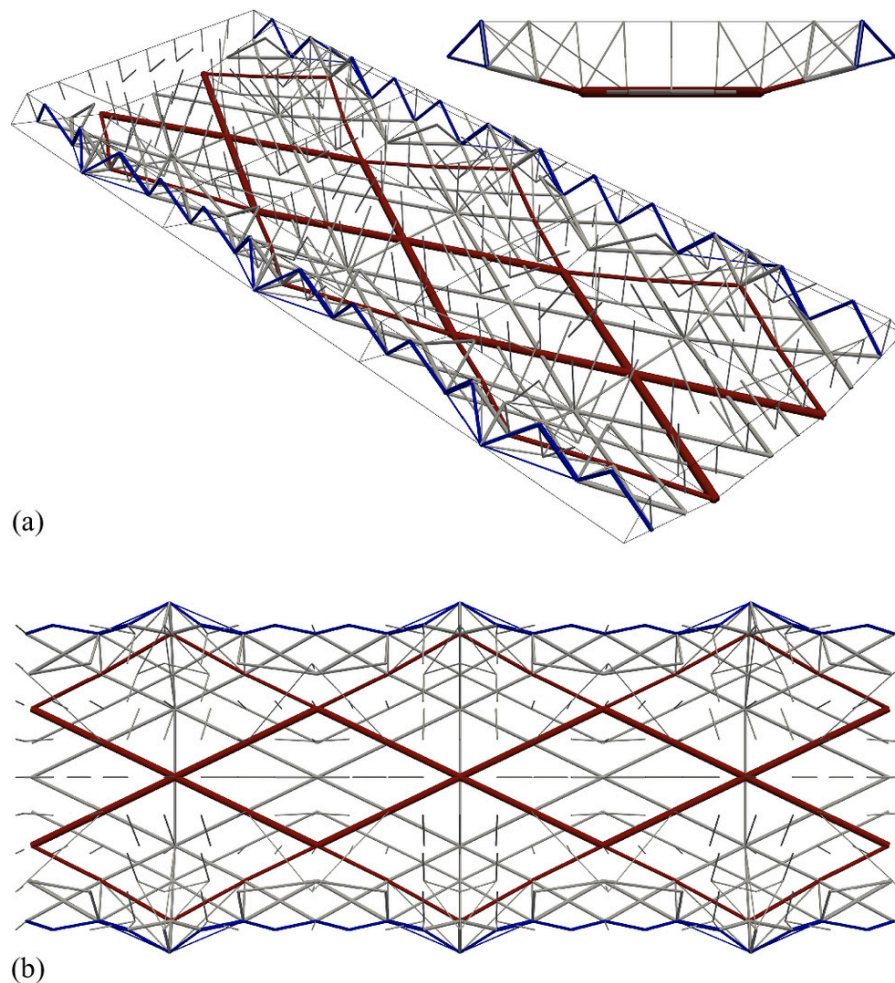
The optimized truss structure found by Baandrup et al. [12] for the Ozman Gazi bridge girder.
